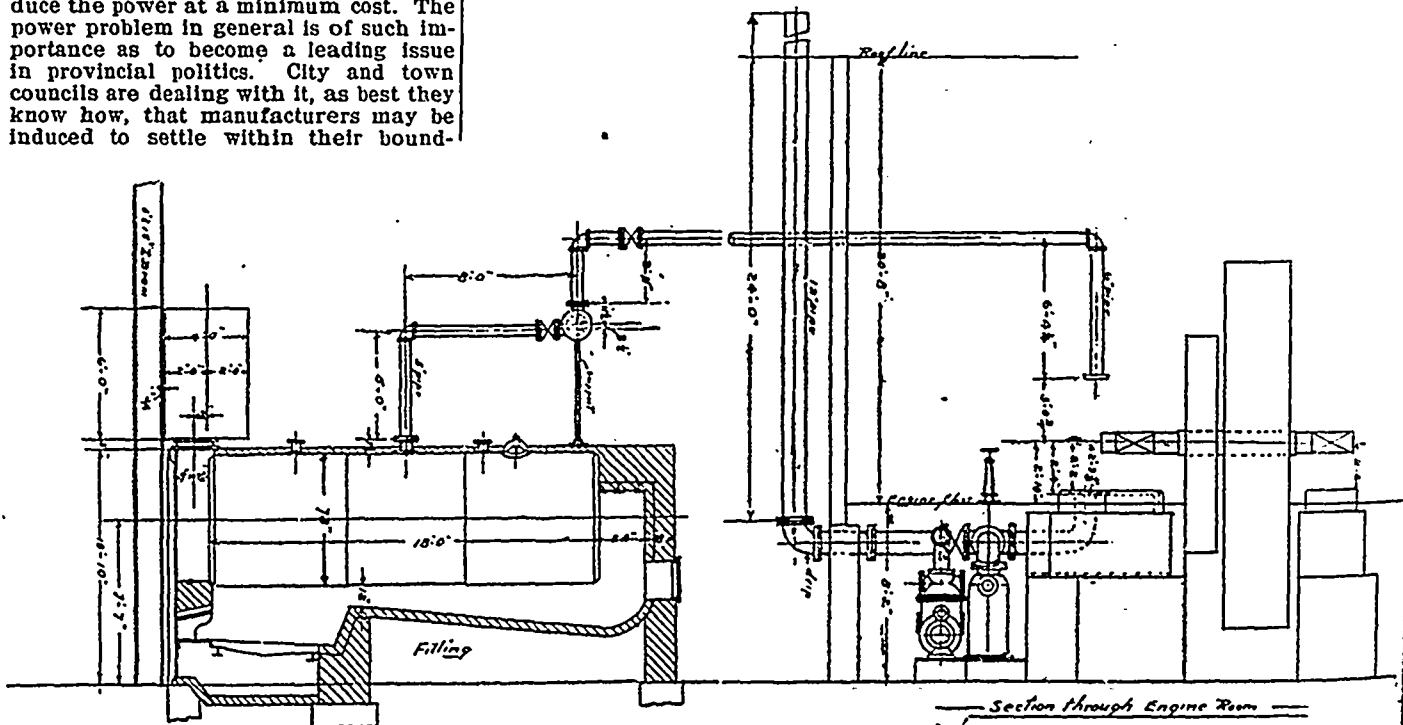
POWER PLANT MCGREGOR-GOURLAY CO.—SECTION OF BOILER AND ENGINE ROOM.
